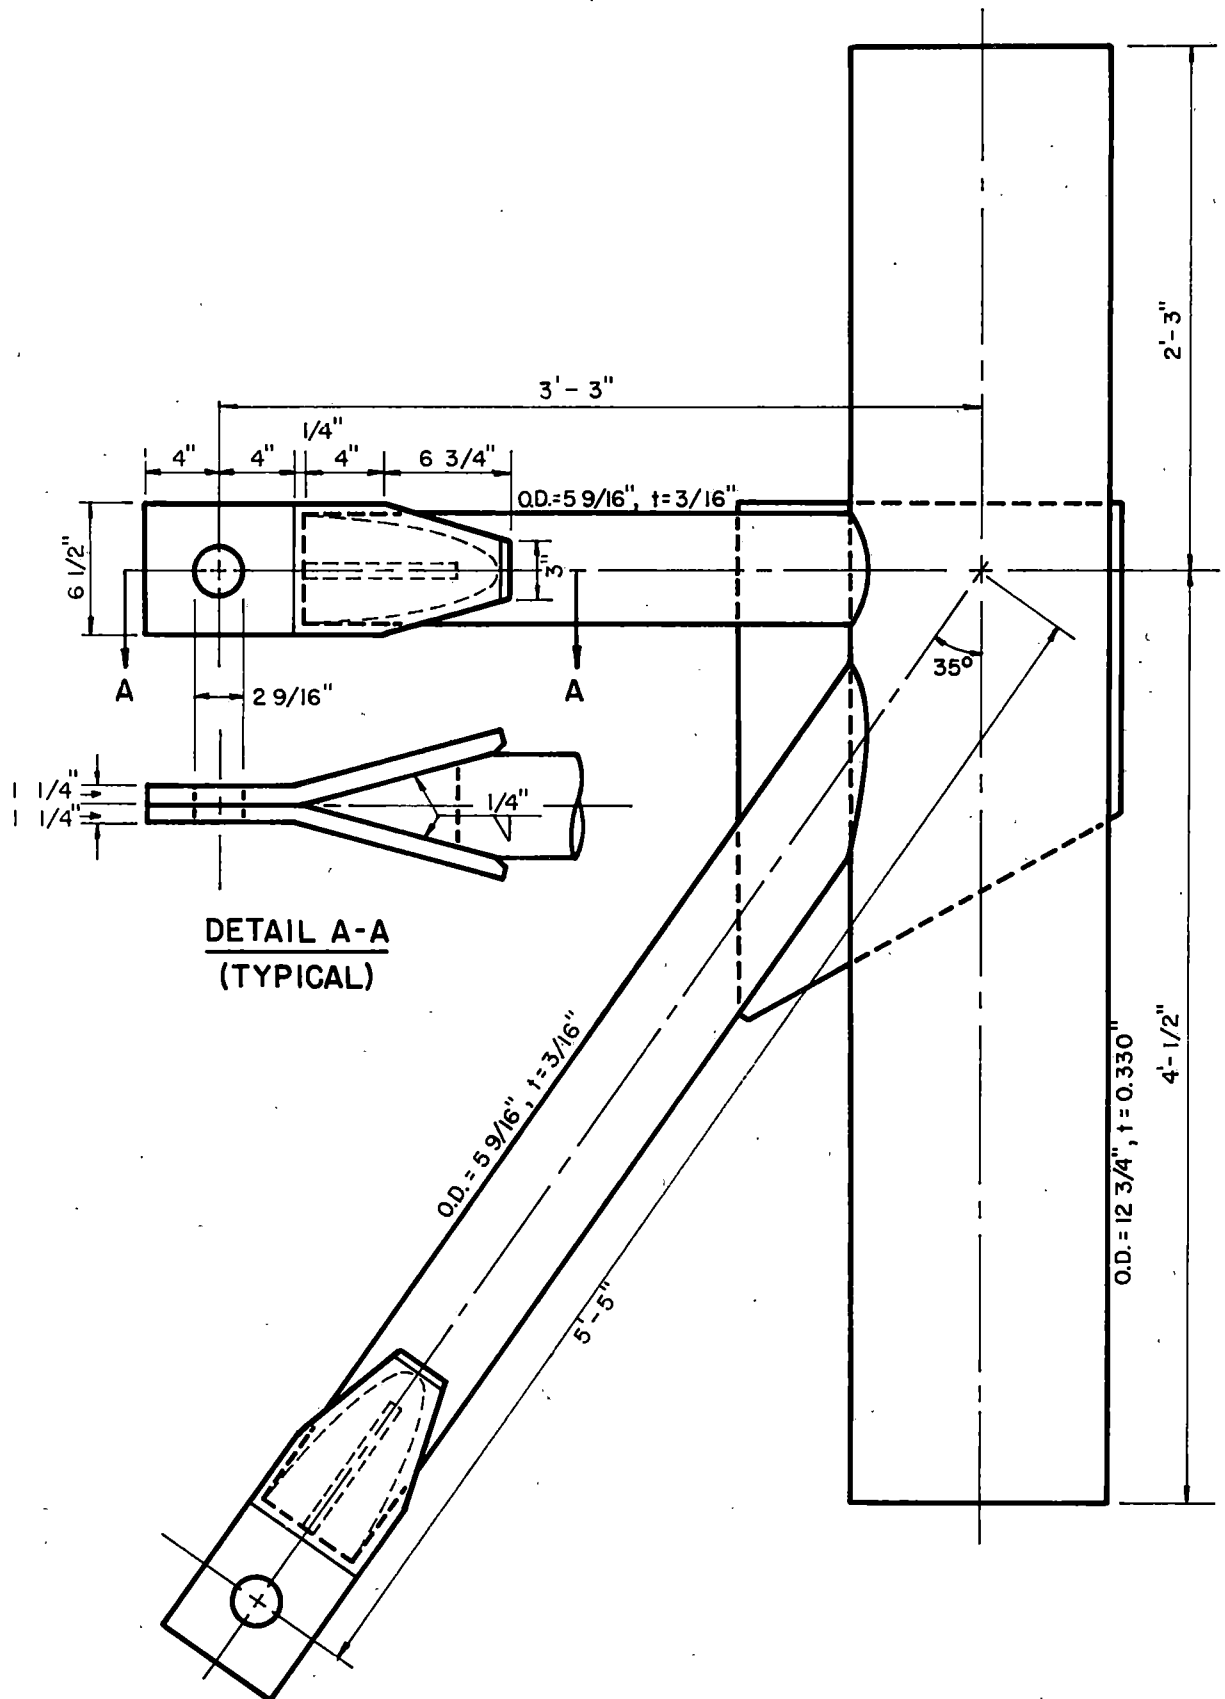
DETAILS OF RING TO TUBE WELDS FOR JOINT 4
